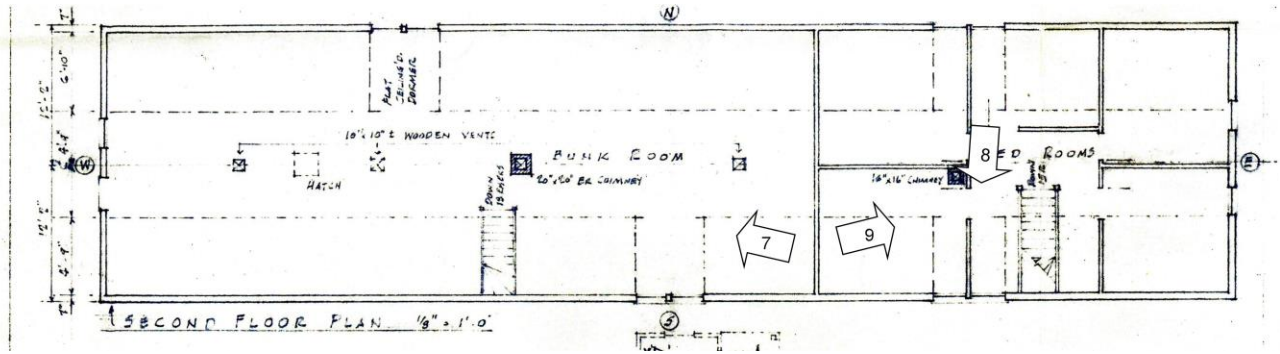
Boarding House second floor plan and photo key. (Image from Yarnelle drawings, Maine Bureau of Parks and Lands files.)
